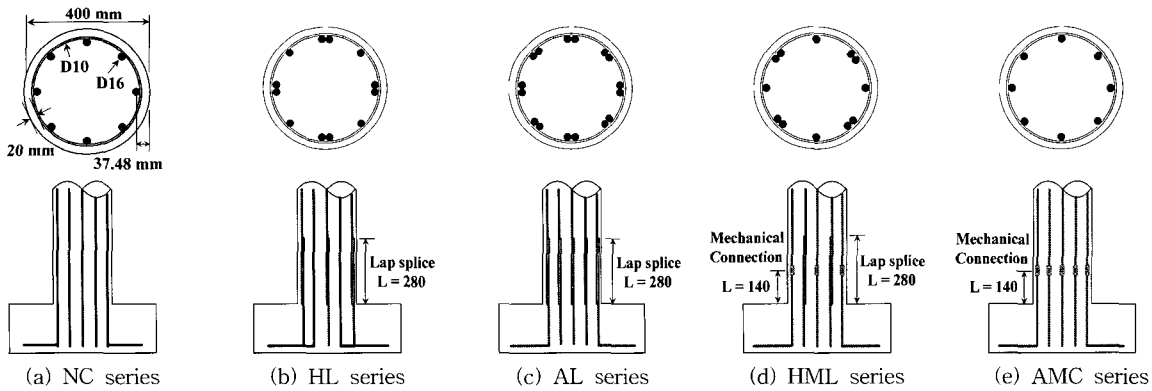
Configurations and details of longitudinal steel connection (unit: mm)
